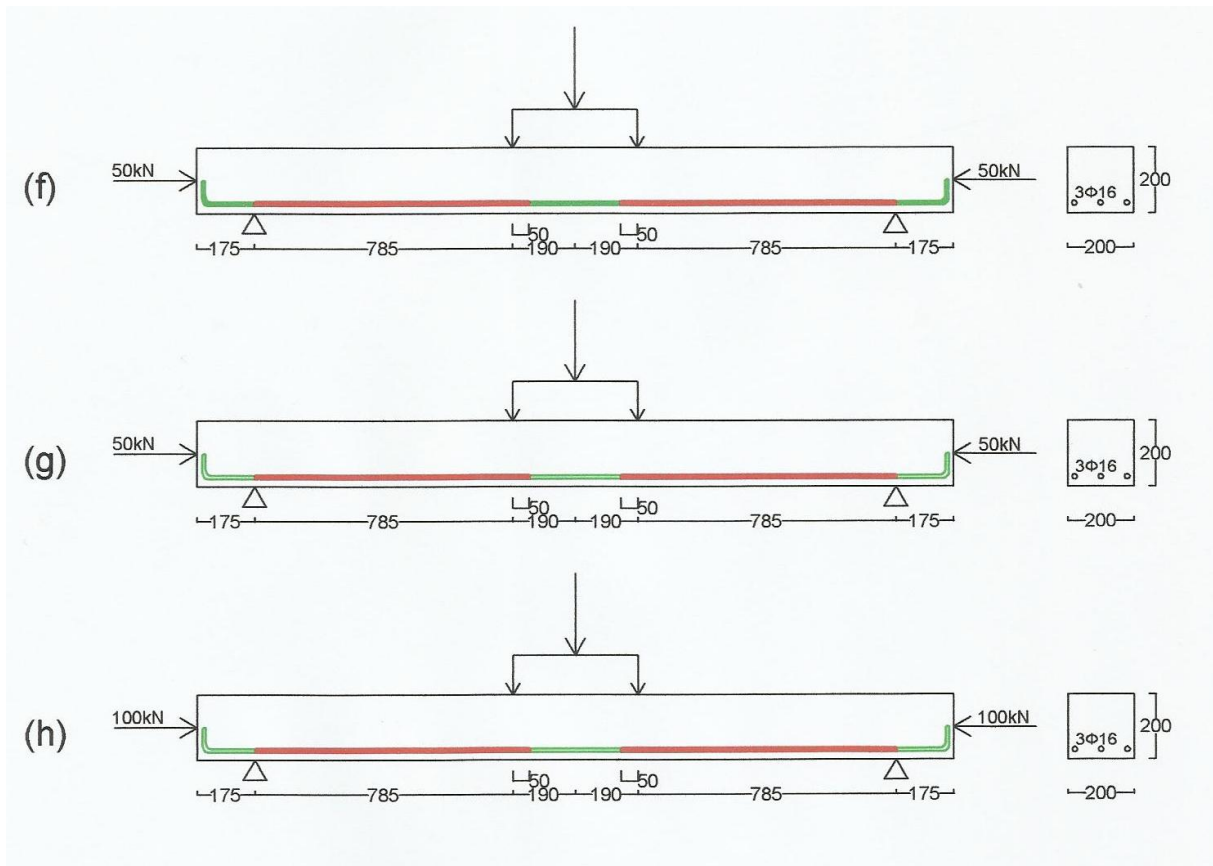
Position of load, transverse reinforcement, and cross sections of beams.
